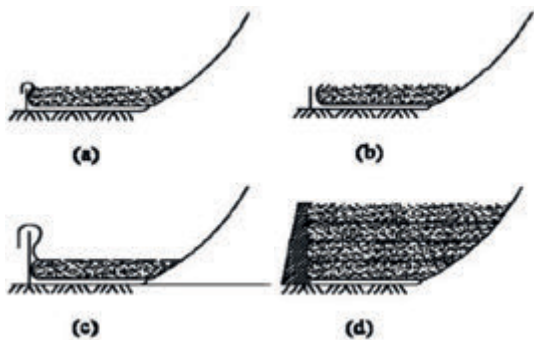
Construction of a reinforced retaining wall using geotextile sheets
